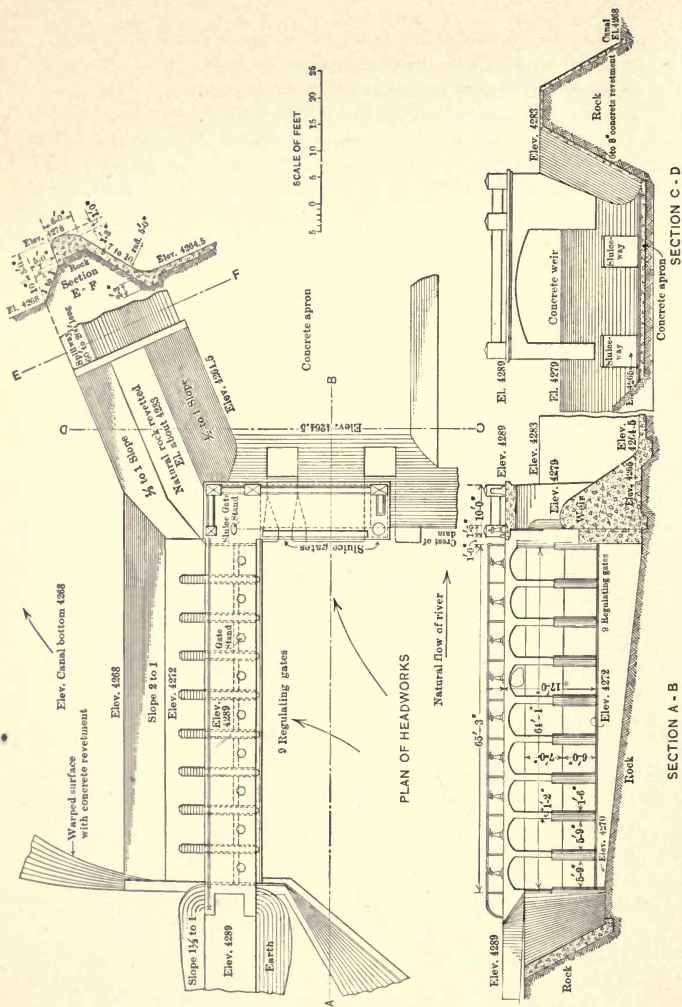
Plan and Elevation of Head-works, Interstate Canal, North Platte River, Wyoming.
